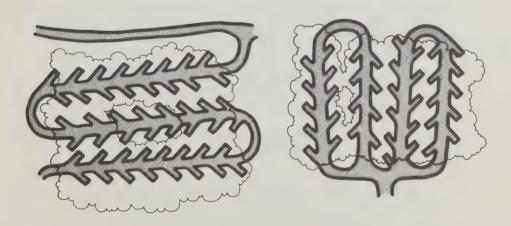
Sample Campground Layouts for Clusters and Parallel Roads
